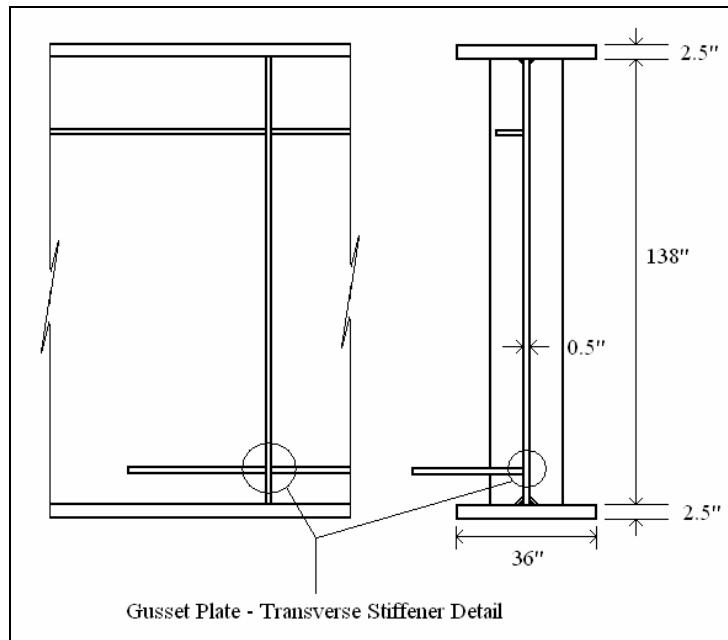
The Gusset Plate-Transverse Stiffener Detail.
